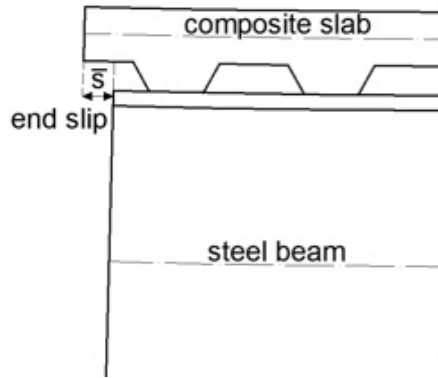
End slip between the slab and the steel section in a composite beam
